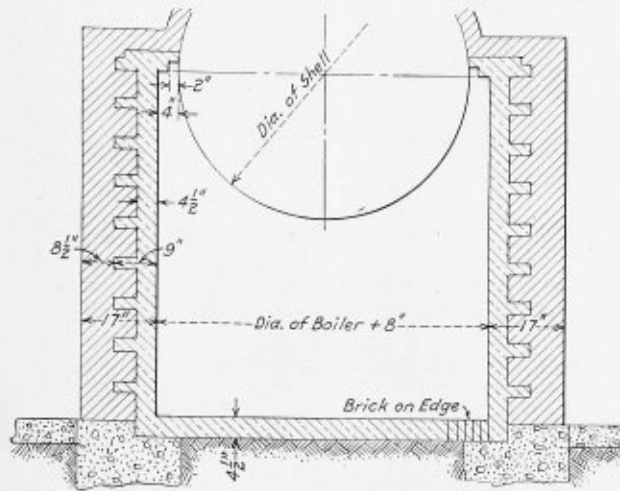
Typical Cross Section Through Horizontal Return Tubular Boiler Setting Back of Bridge Wall
